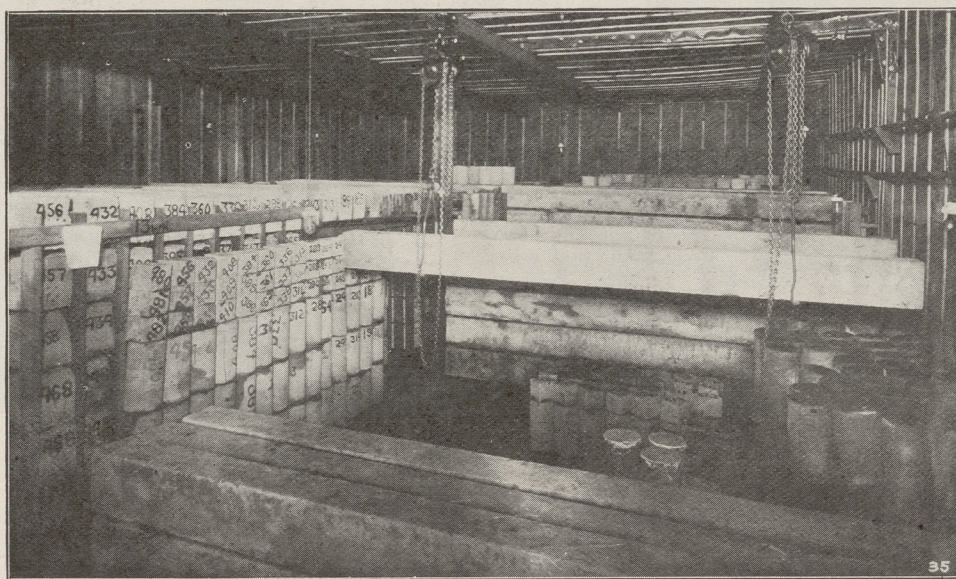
ROOM IN WHICH CONCRETE BEAMS ARE STORED.
